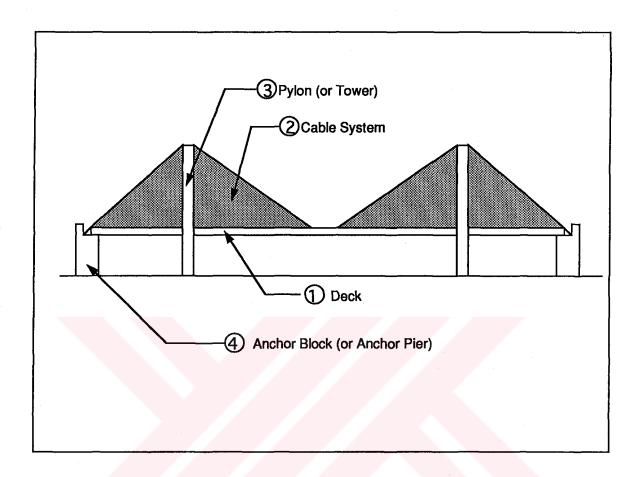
MAIN COMPONENTS OF A CABLE SUPPORTED BRIDGE
